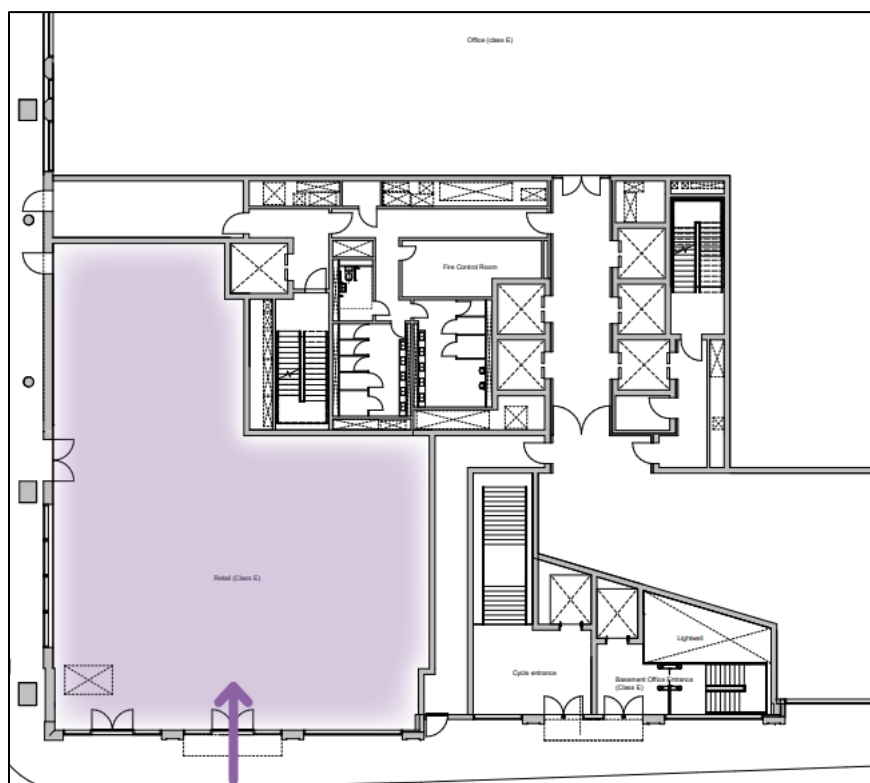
Possible Ground Floor AWS Location 2 (highlighted in purple)
